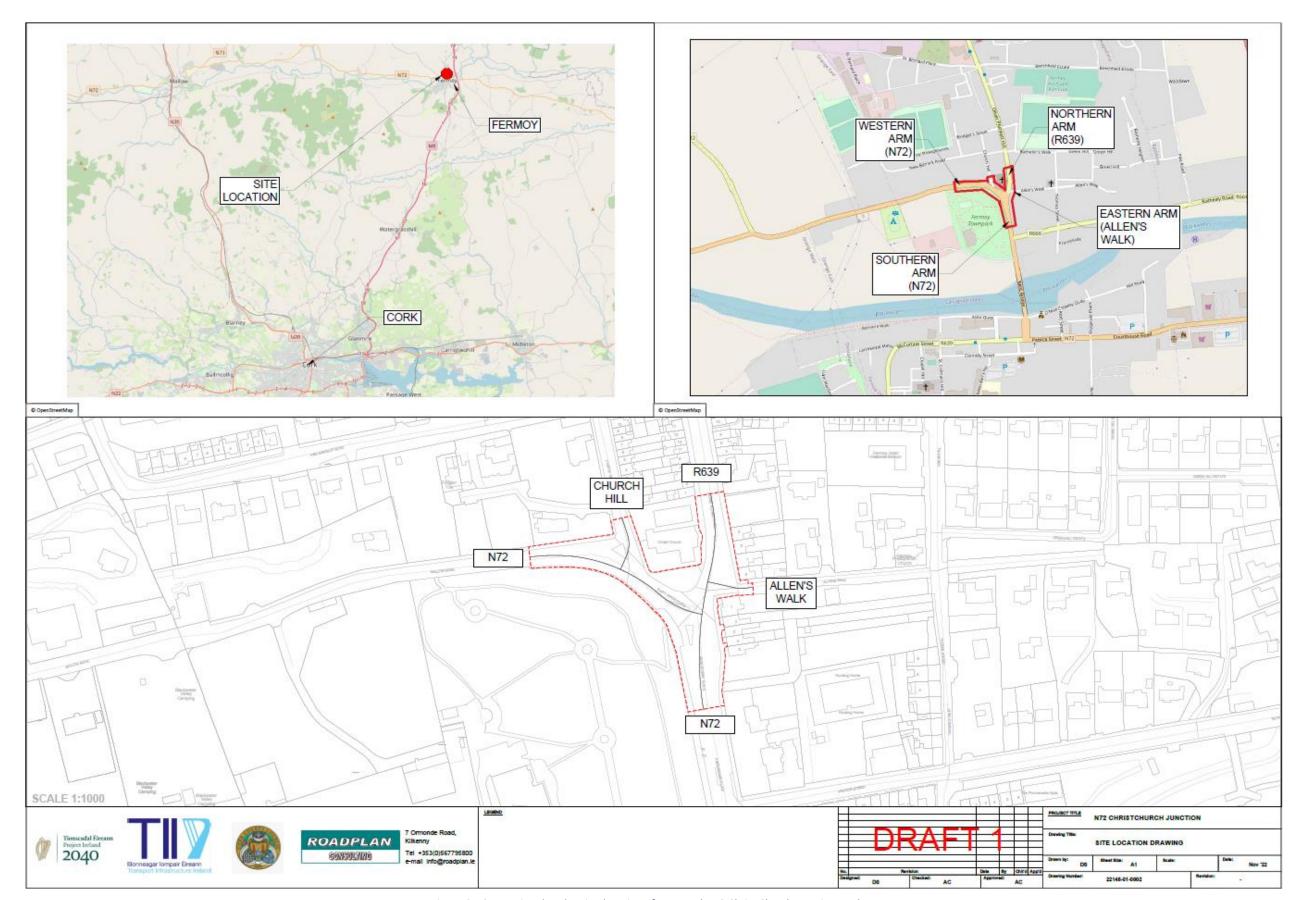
Composite plan showing location of proposed N72 Christ Church Junction works.
